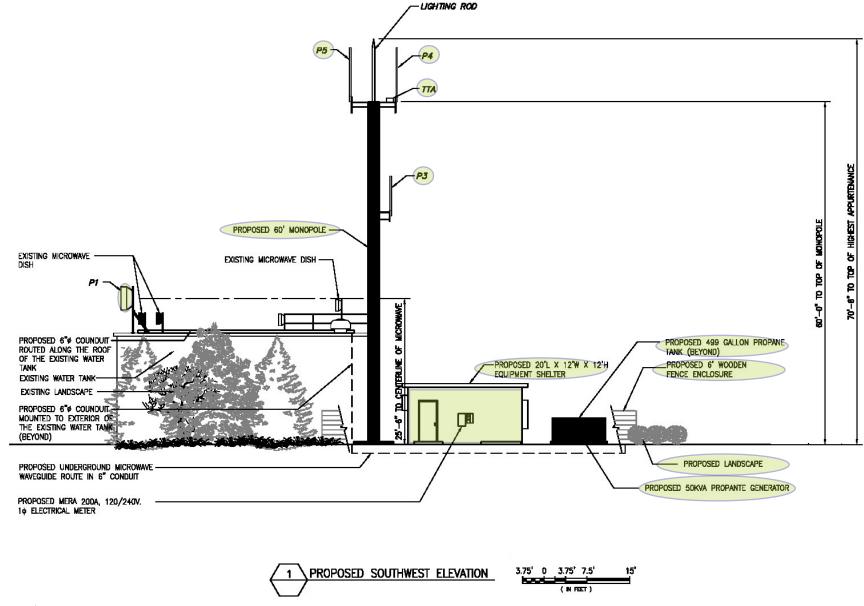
Site 23 - Muir Beach Proposed Elevation
